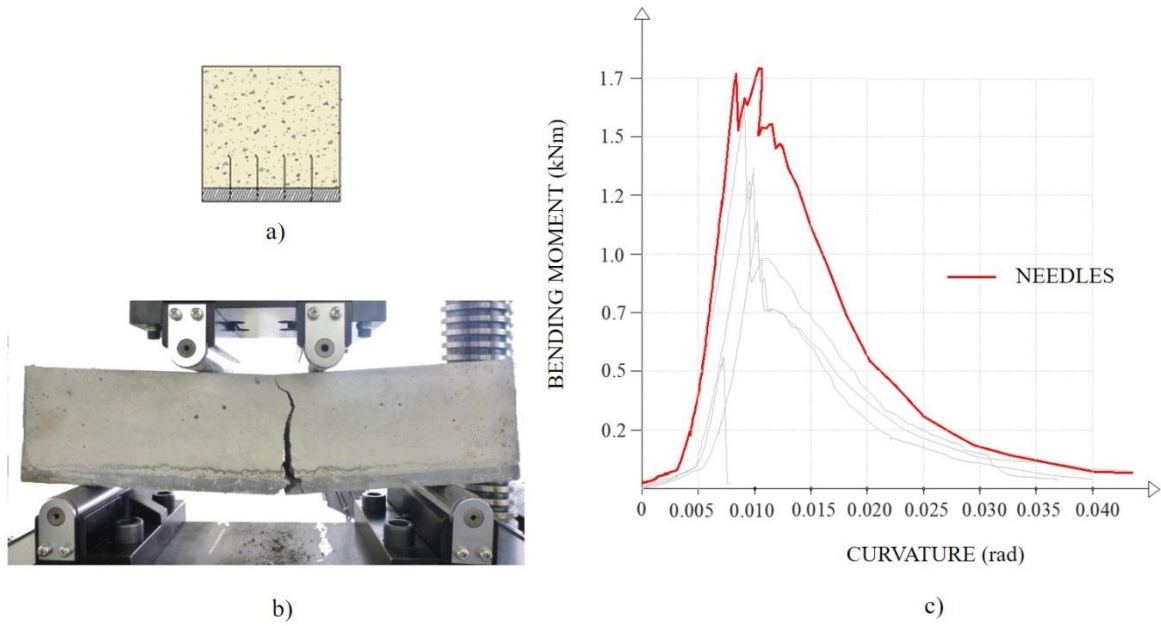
4-Point bending test on specimen “GEOMETRY A”:
